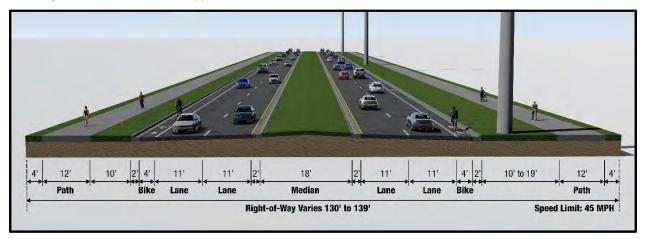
Alternative 1 – Typical Section from Partin Settlement Road to Old Canoe Creek Road
